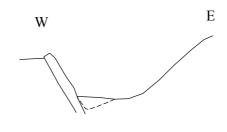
Section of the Bridge Reception Pit at SH 69849 47462 Scale 1:10
